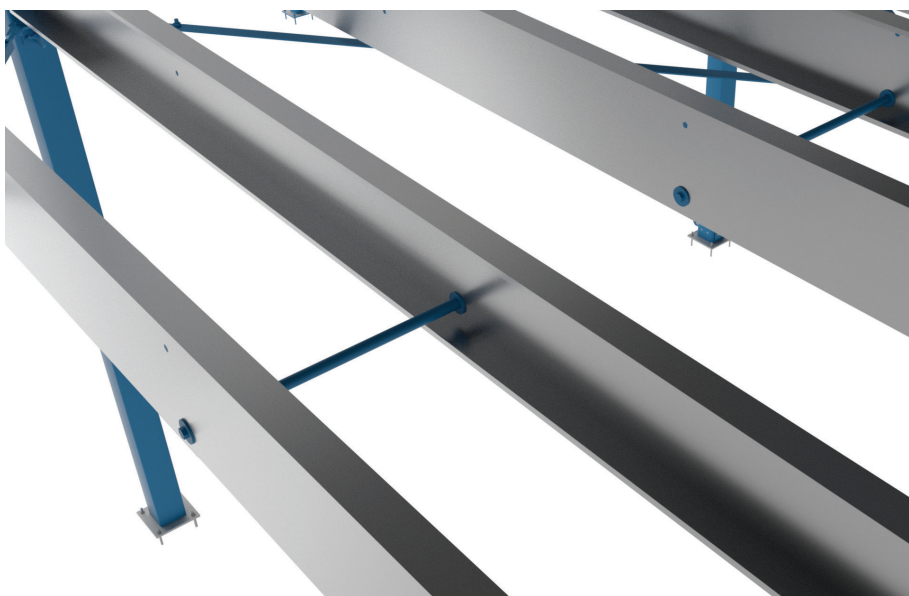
Diagram of the stiffening bars in a layout with an even number of floor beams
